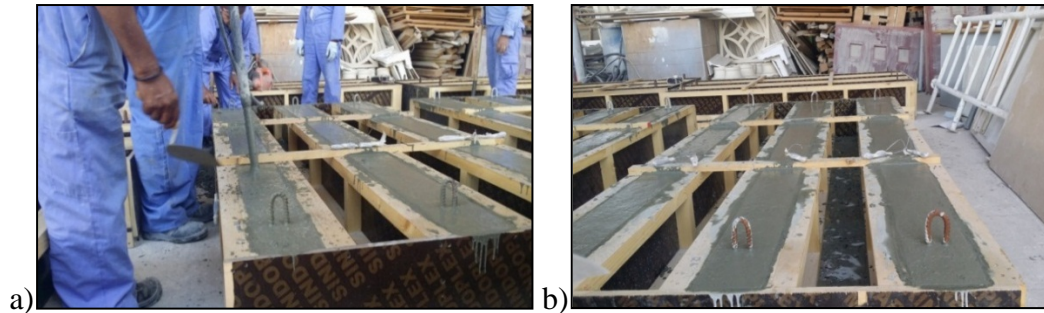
Casting of beams a) use of vibrators; b) Finishing of concrete
